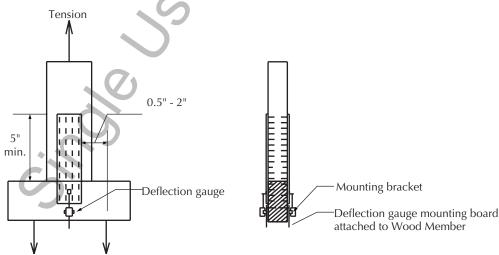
Fabrication of Test Specimen for Measuring Wood-To-Plate Slip.
